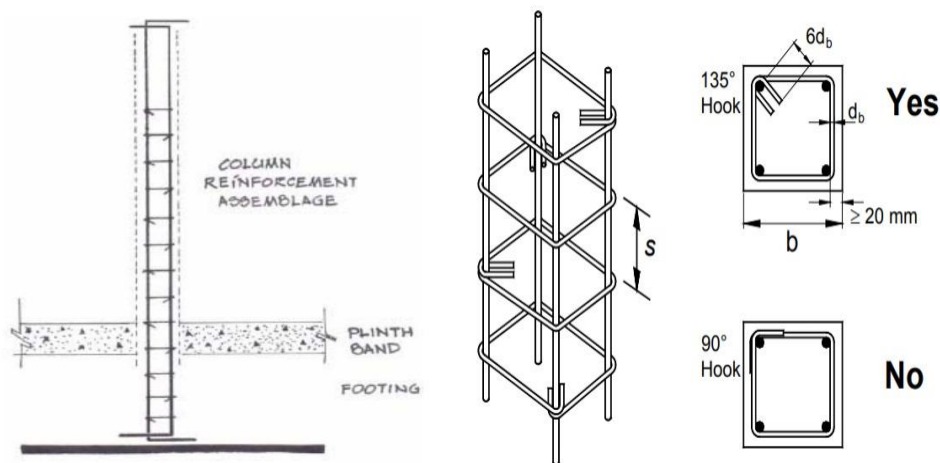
Placement of tie-column reinforcement before the construction of foundation and walls (left) and Tie-column reinforcement details (right).
